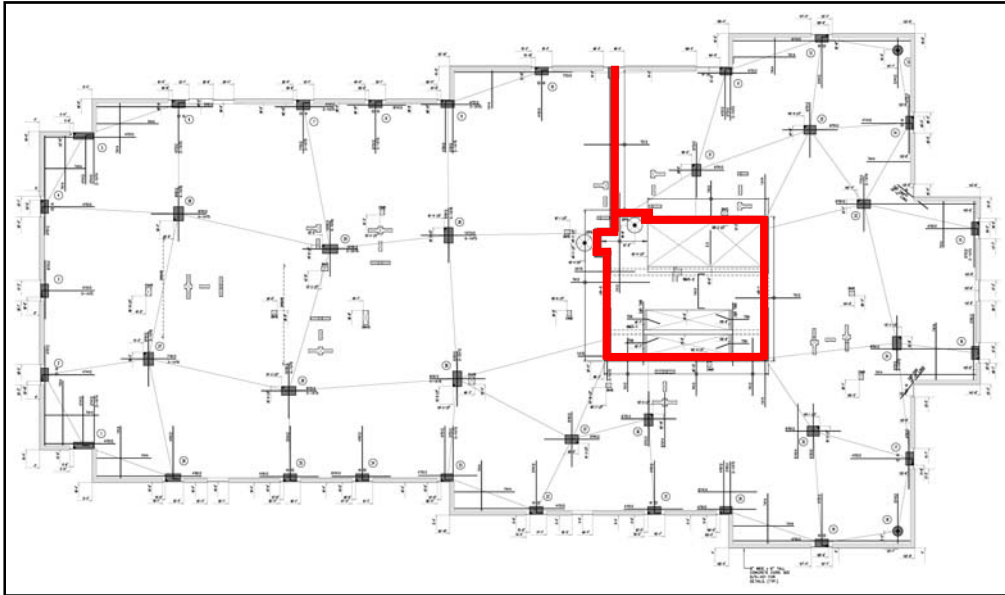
Typical floor plan for Roosevelt Island Southtown Building No. 5 with the shear wall lateral system highlighted in red
